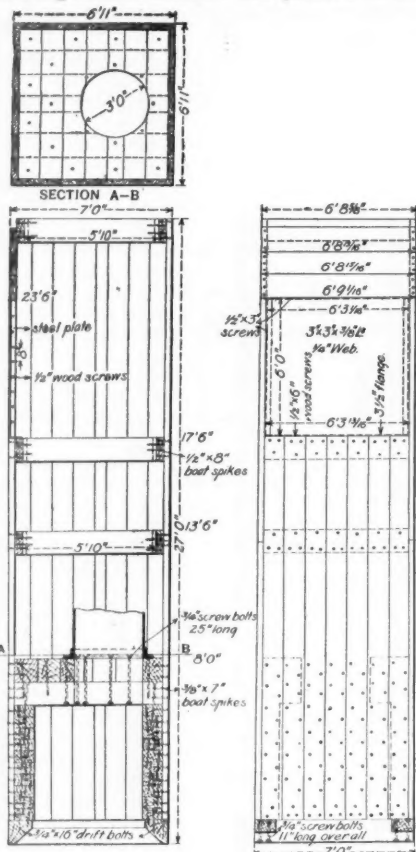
Yellow Pine Caissons Used to Sink Foundations for Mercantile Building.
